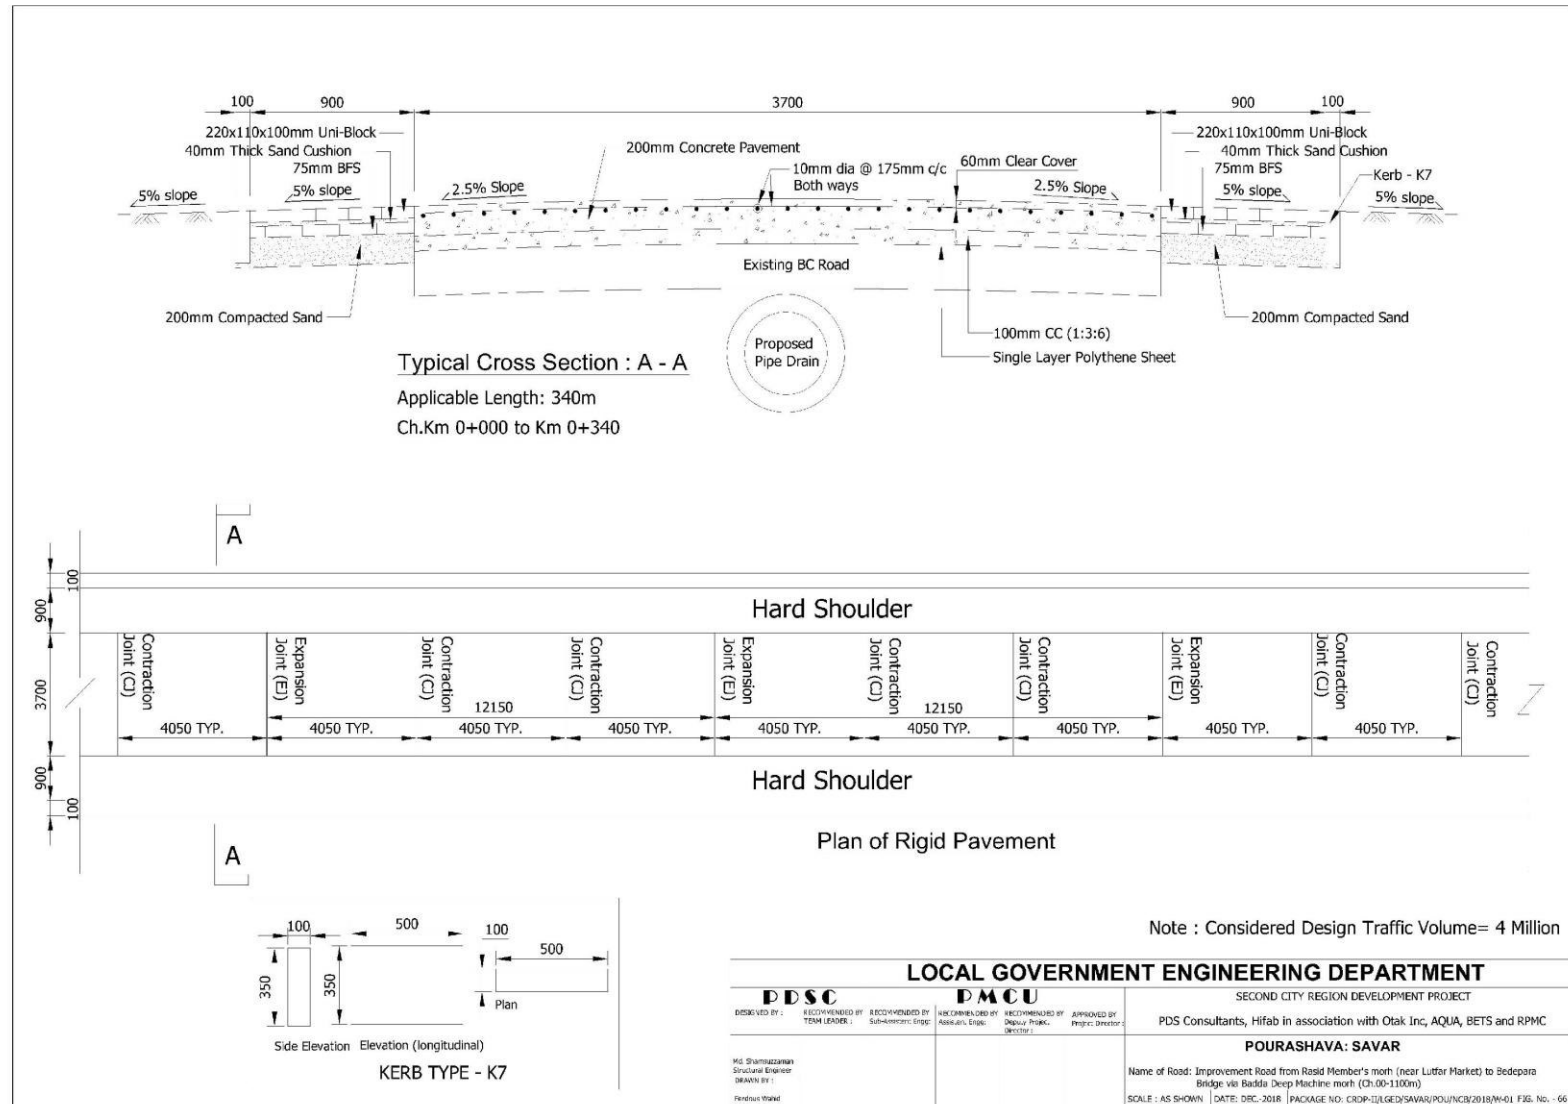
Cross section of road from Rajashan Sufia Bakery to Gasmohol Bridge
